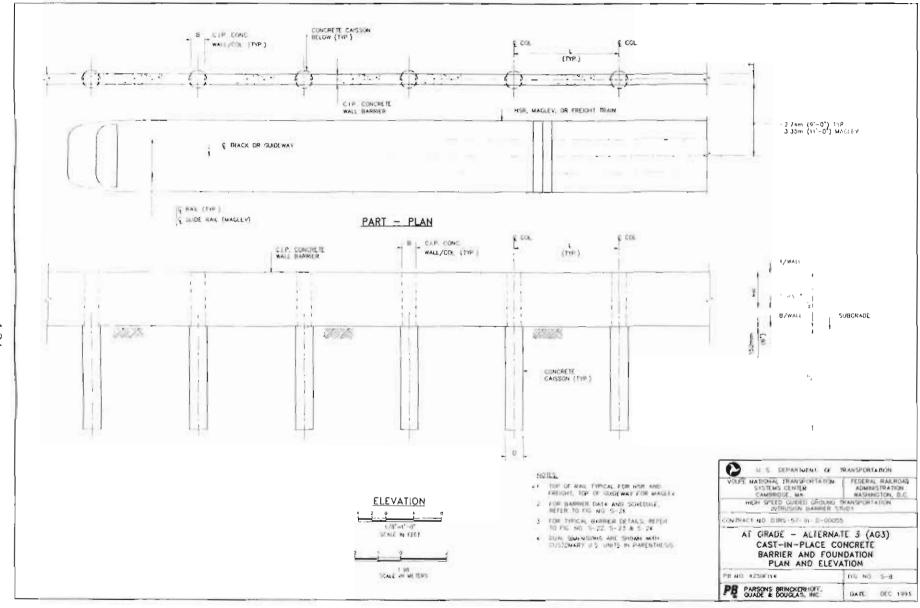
AT GRADE ALTERNATE 3: CAST-IN-PLACE (C.I.P.) CONC. WALL AND C.I.P. FOUNDATION - PLAN AND ELEVATION
